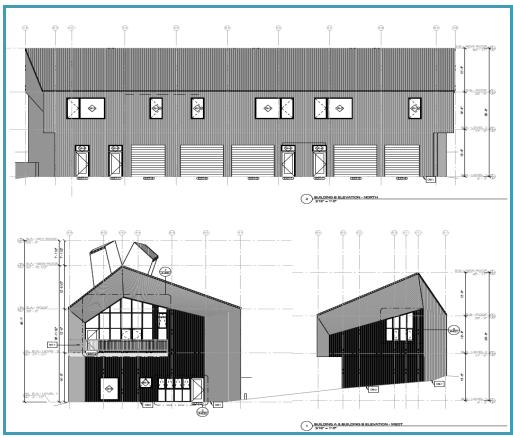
A- 5E| BUILDING ELEVATIONS
